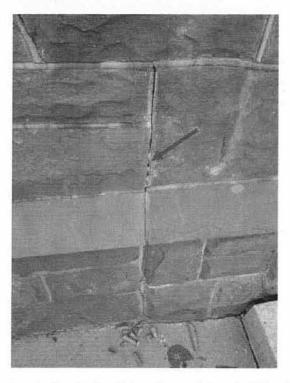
South façade sandstone building base – limited open joints at sandstone masonry.
